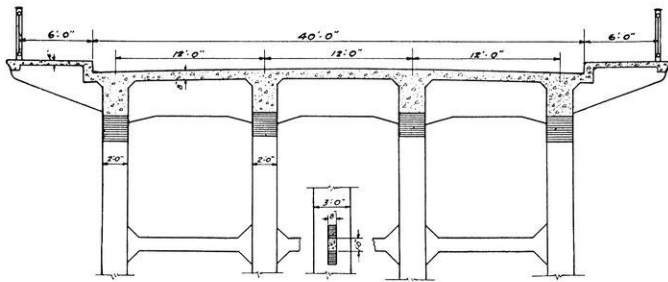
This shows the details of the floor slab with sidewalks on each side, and railings.
